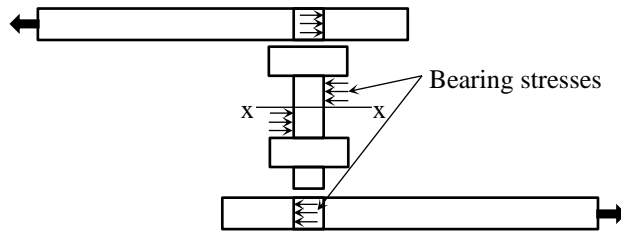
Load transfer mechanism of bearing-type bolted connection
